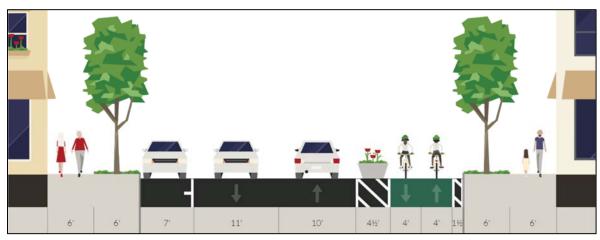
First Street Typical Cross Section, north of William Street – Proposed Design
